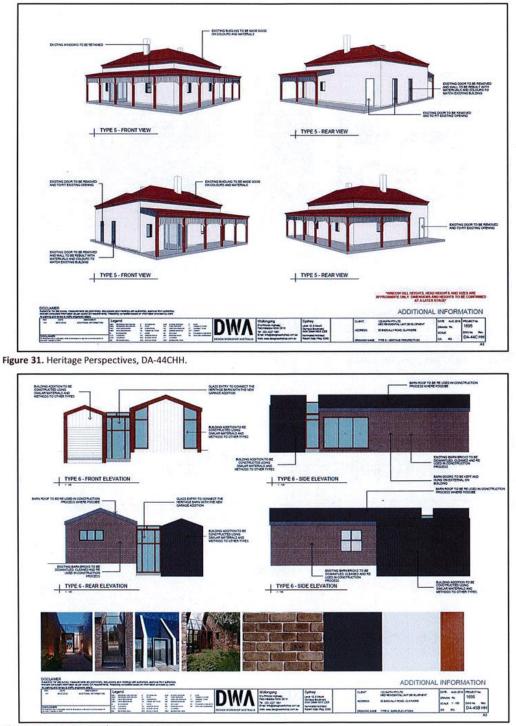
Type 6, Barn Elevations, DA-45BHH.
